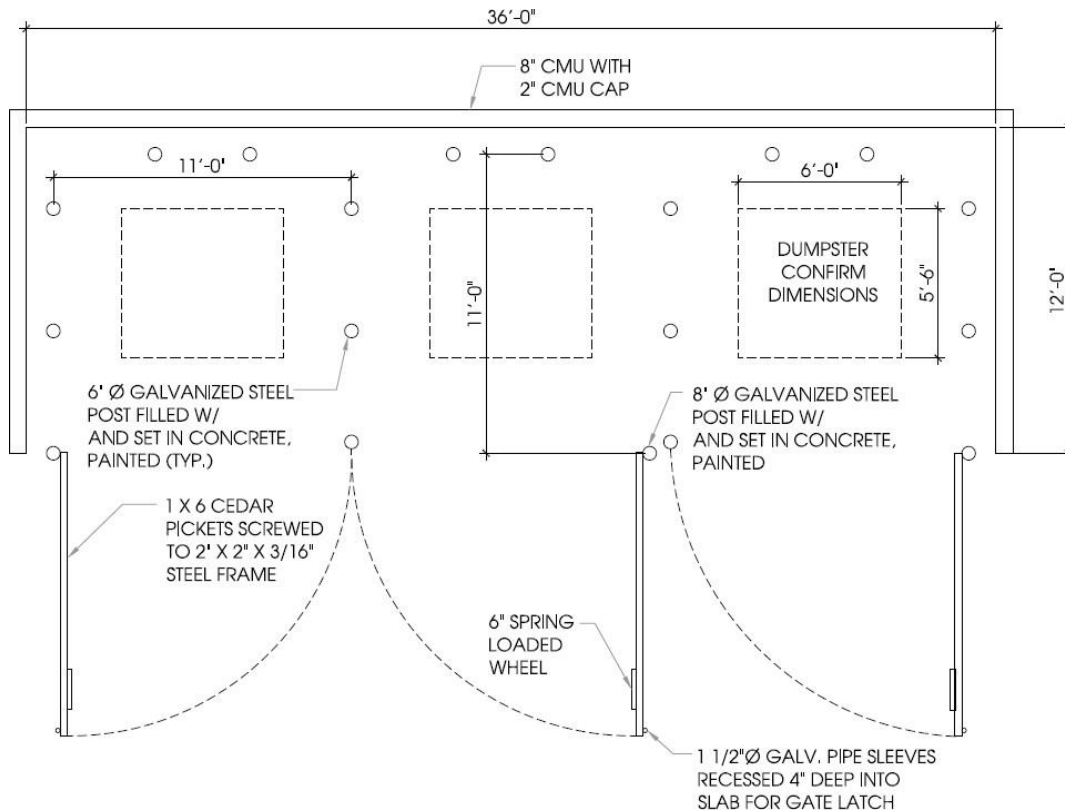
30 00-01: Typical Dumpster Enclosure Layout
